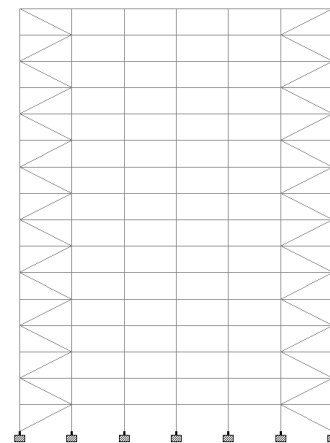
Typical Elevation of 16 Storey Building with Zigzag bracing.
